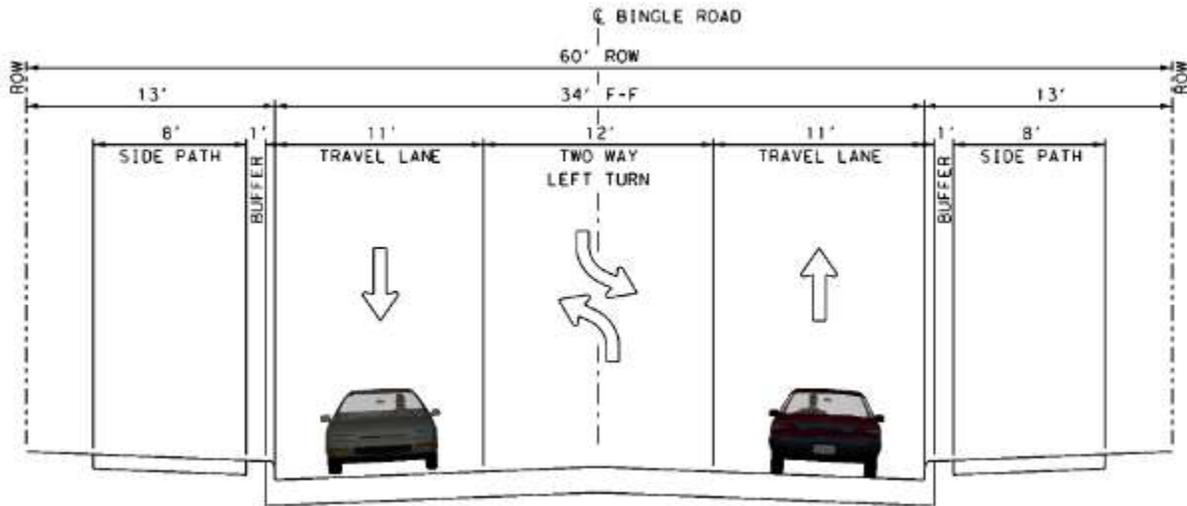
(Option 2) Proposed 3-Lane Section (Reduce Existing Pavement Width, Add Side Paths)
